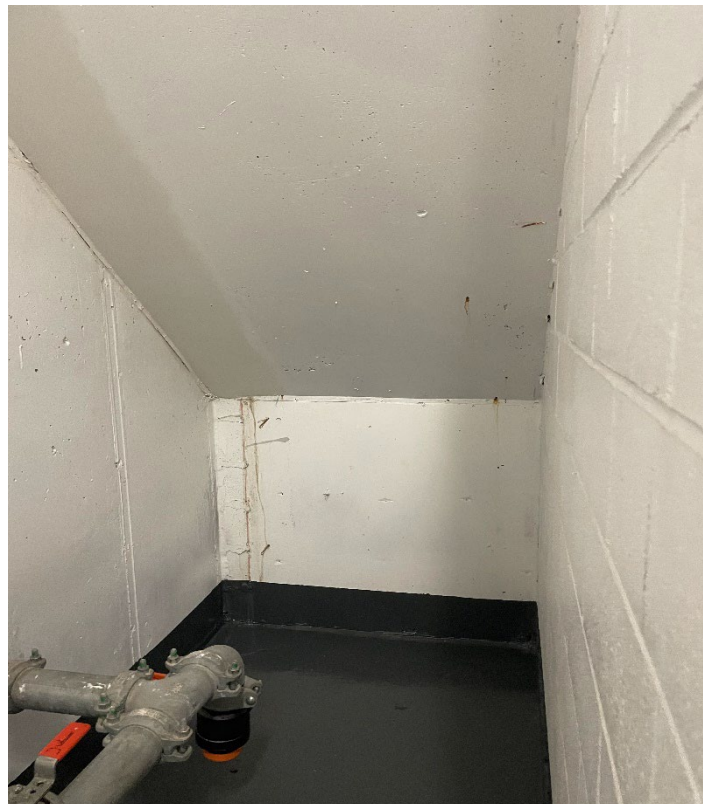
Photo of the concrete slab in a mechanical room of the Site's cellar.
